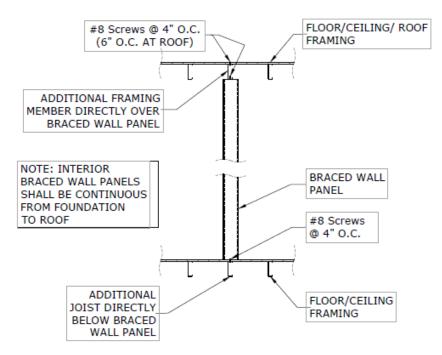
Braced Wall Panel Connection Parallel to Roof/Ceiling/Floor Framing
